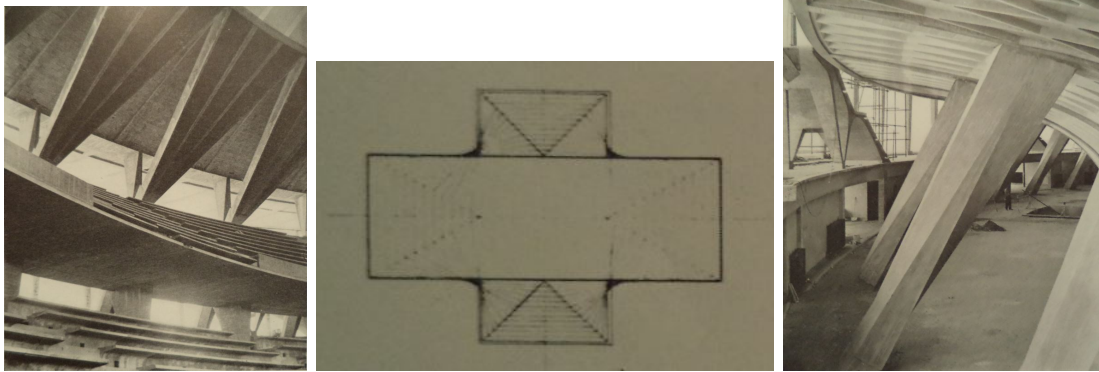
Structural fans, section and on-site view of pilasters supporting the dome[8]
